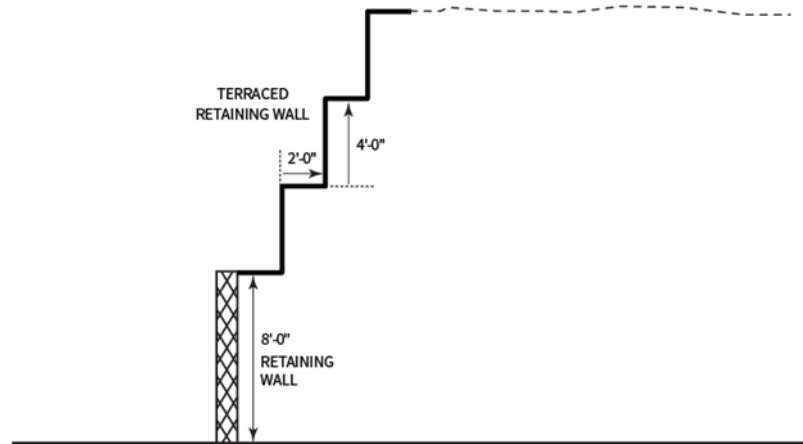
H: Rear Lot Retaining Wall Design
